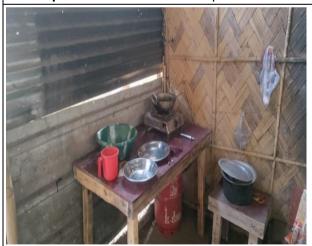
Gas cylinder provided to labour camp at Chhaygaon S/S
